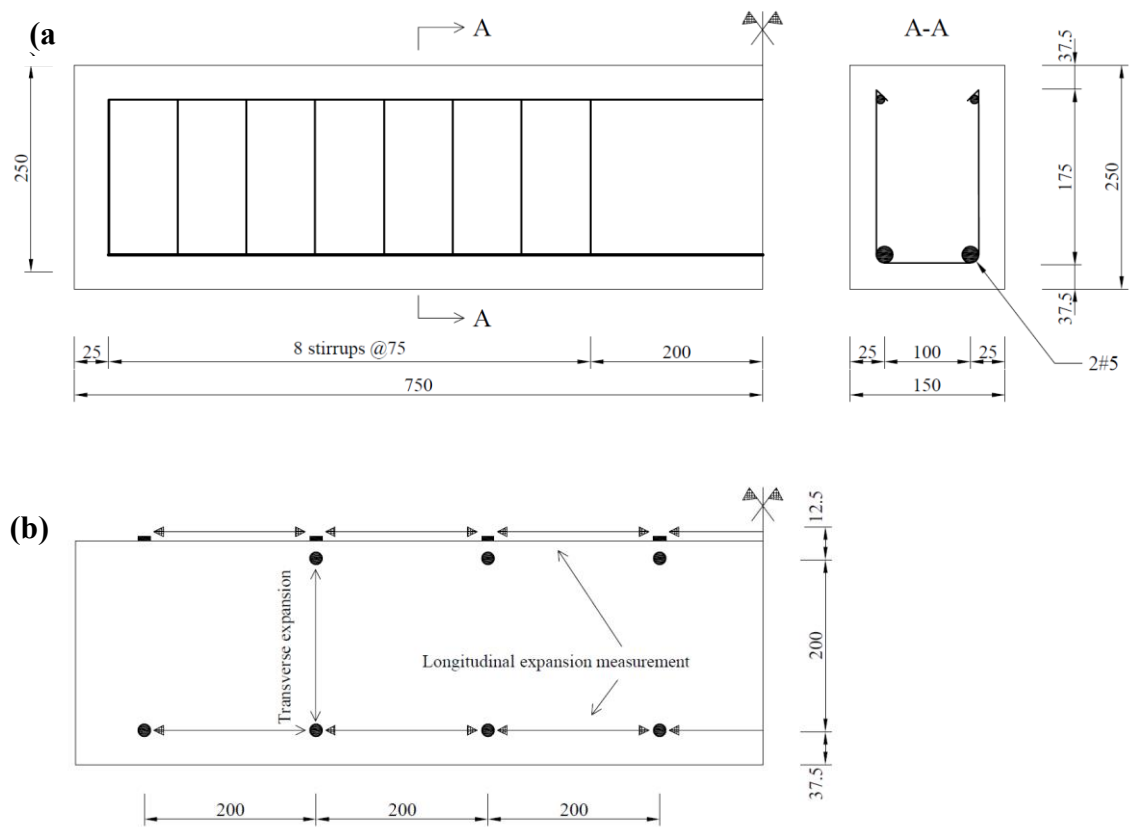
Reinforced concrete beams tested in Fan & Hanson (1998): (a) Dimensions and reinforcement configuration, (b) expansion measurements (unit: mm).
